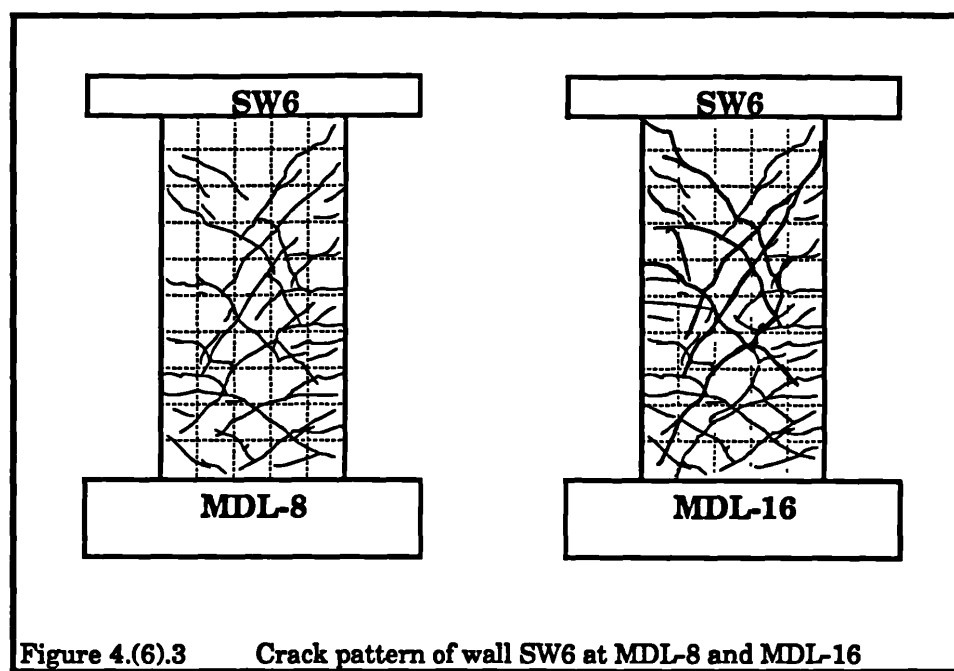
PilaSW6: DSr1 - cracks at MDL-8 (yield) and MDL-16 (spalling/maximum load)
